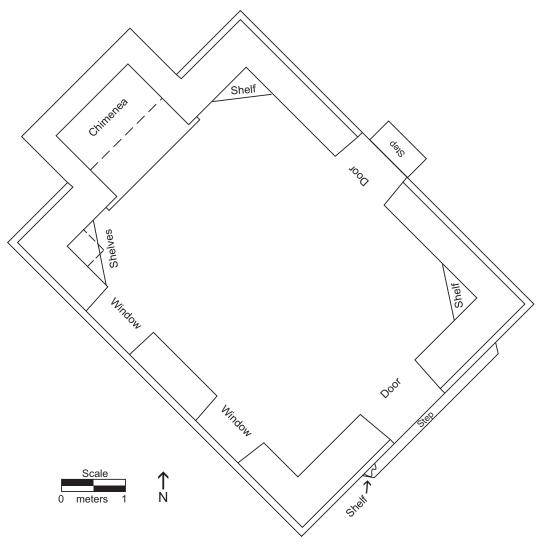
Plan view of stone house at Rancho El Saladito.
